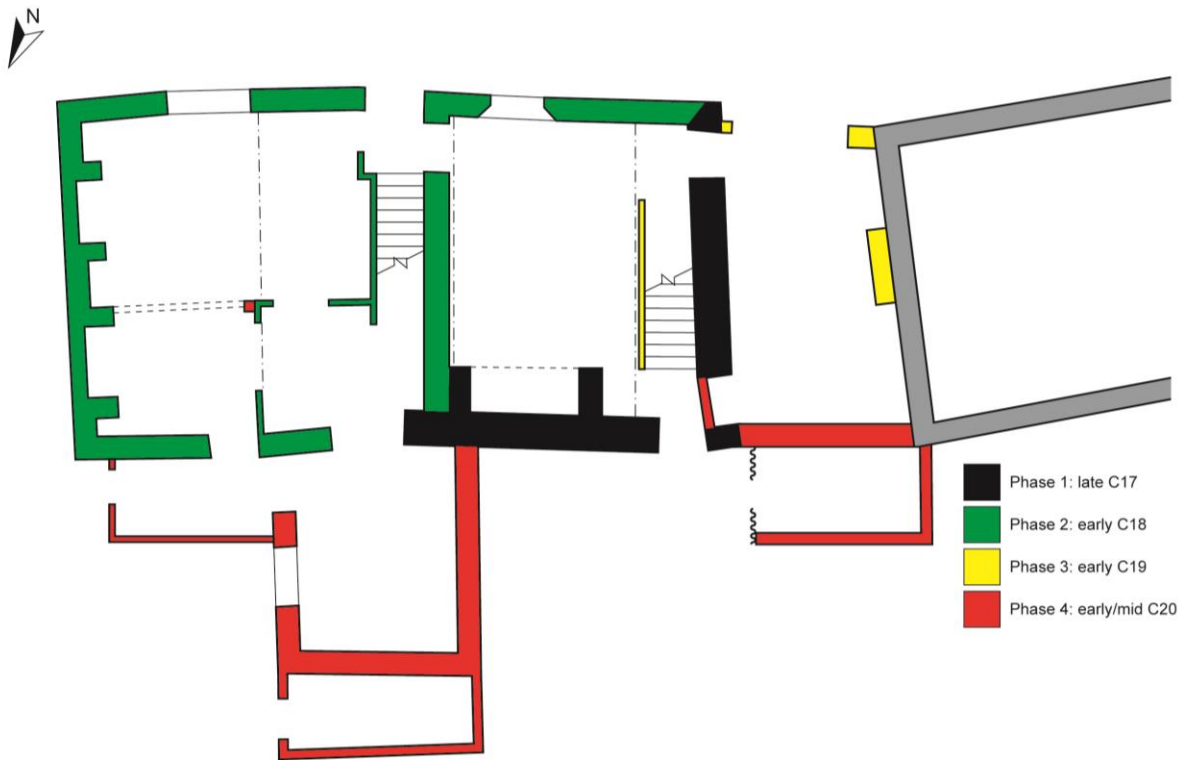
PROVISIONAL PHASED GROUND-FLOOR PLANS.
